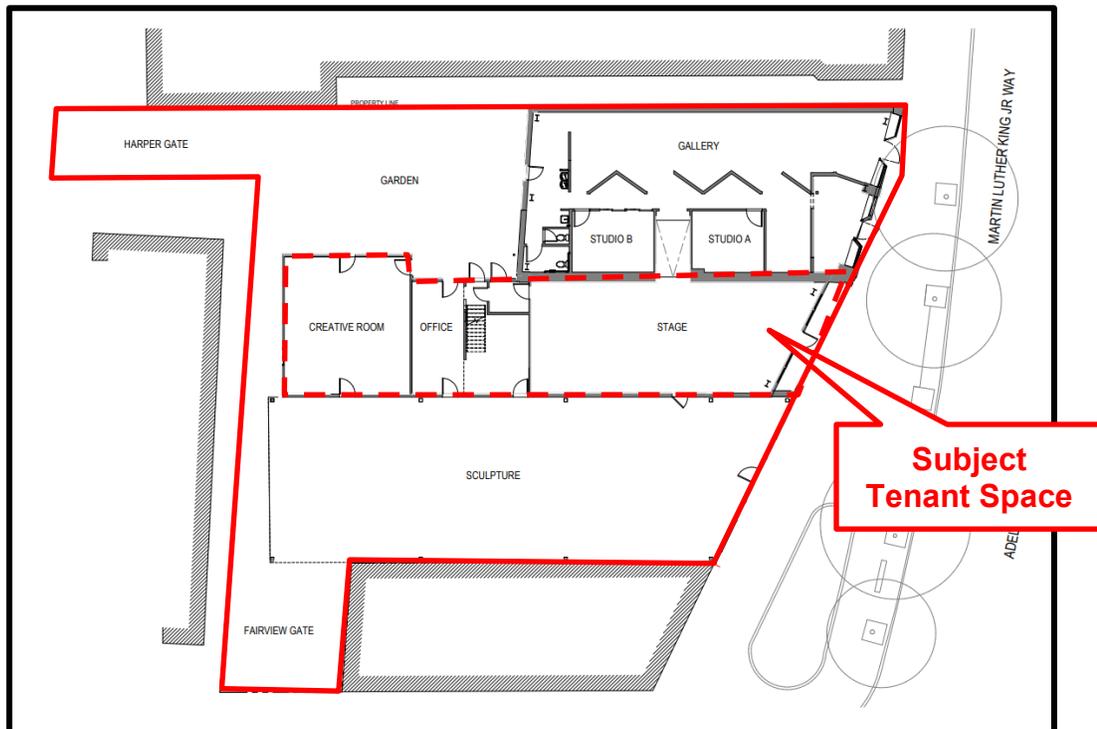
Existing Site Plan, Sheet A00, Attachment 1- Project Plans
